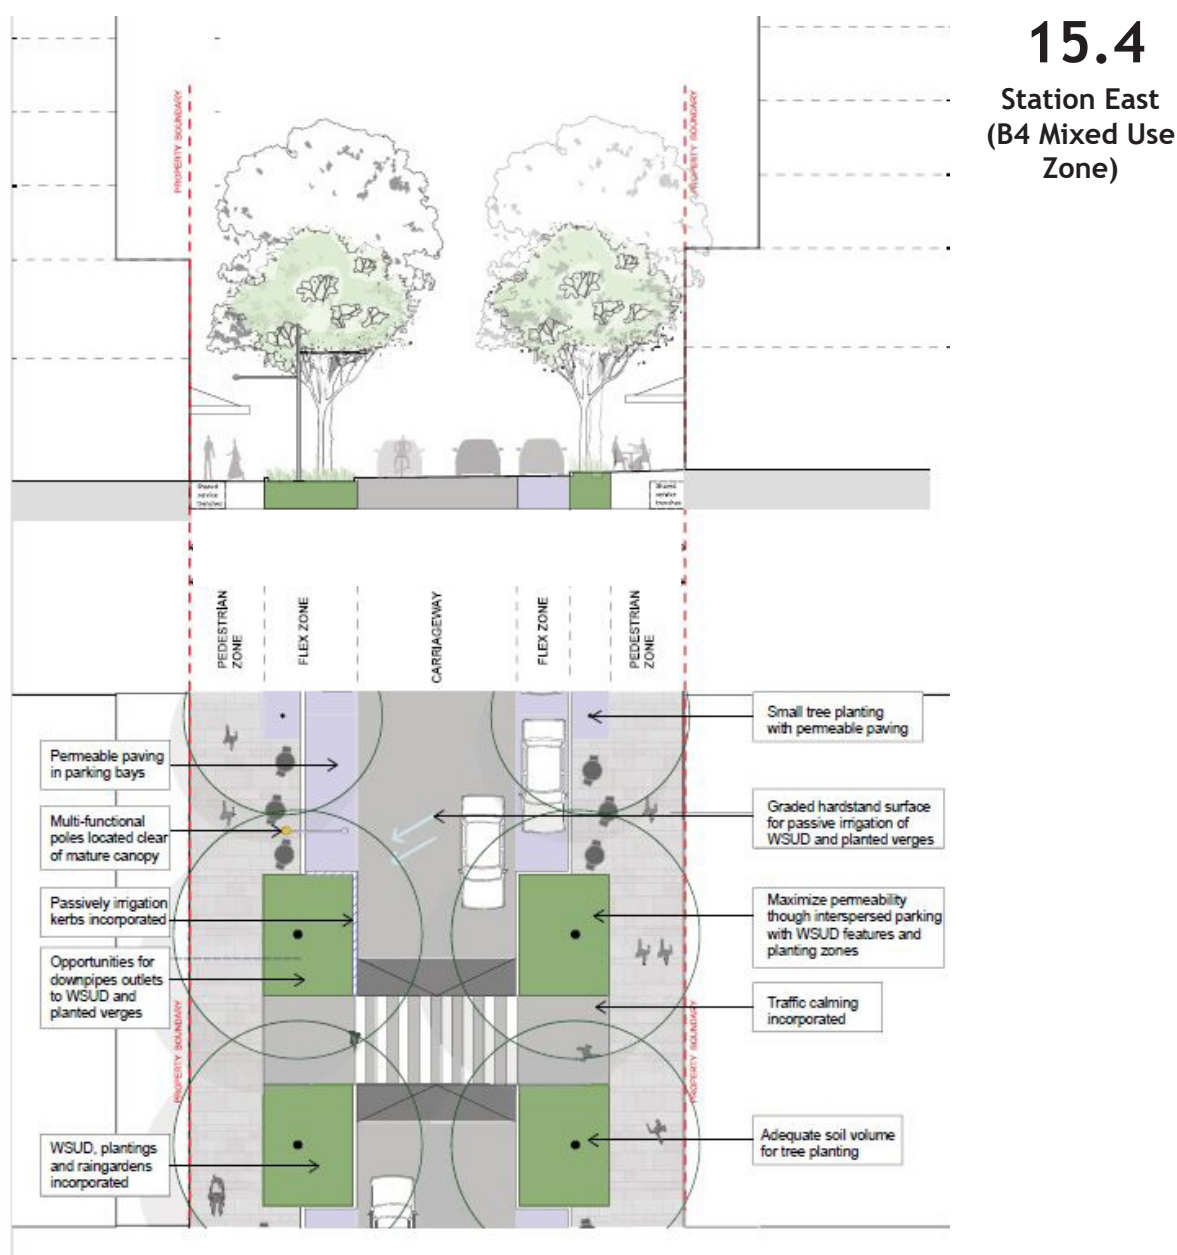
Hosking Crescent Typical Plan and Section showing street character including two storey street wall height (zero setback)
